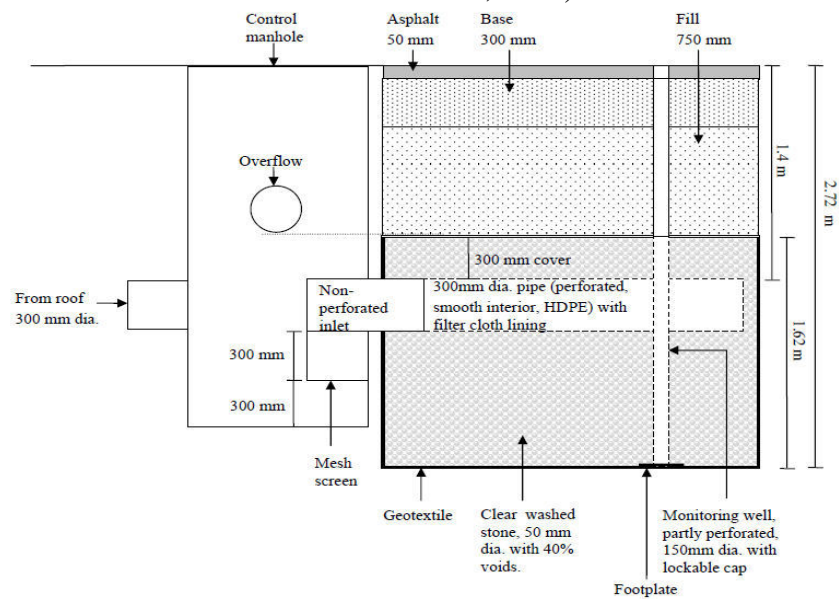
Cross section of infiltration trench receiving roof runoff only (Seters et al., 2013).
